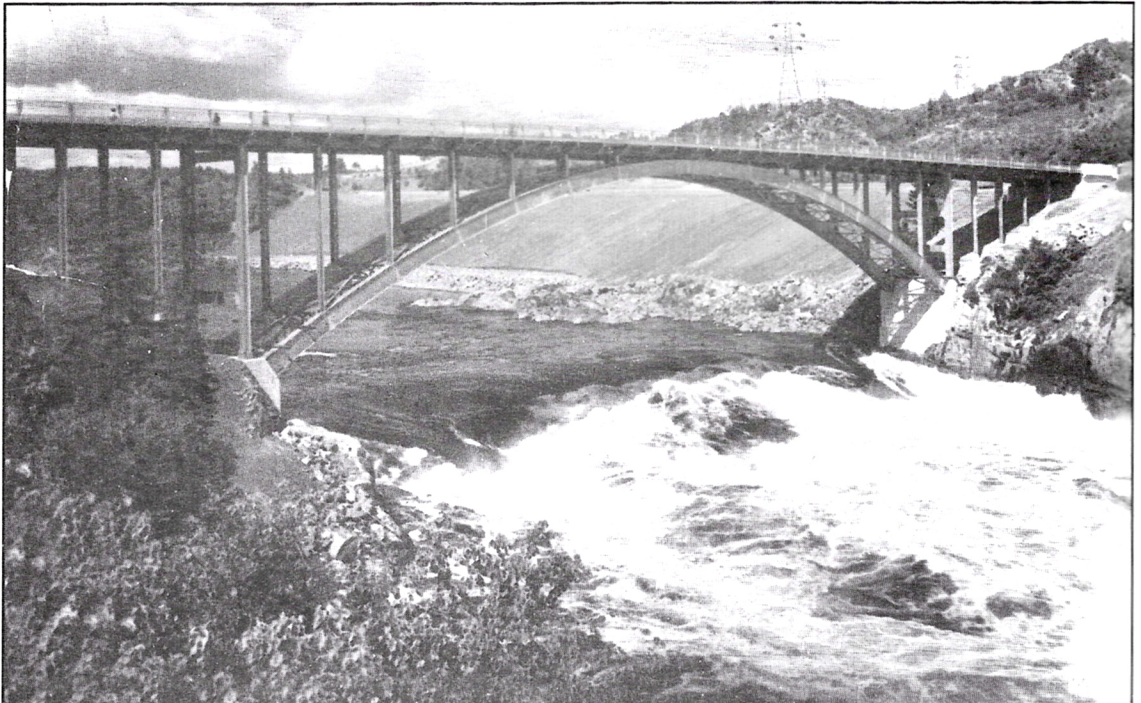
BRACED RIB ARCH BRIDGE
